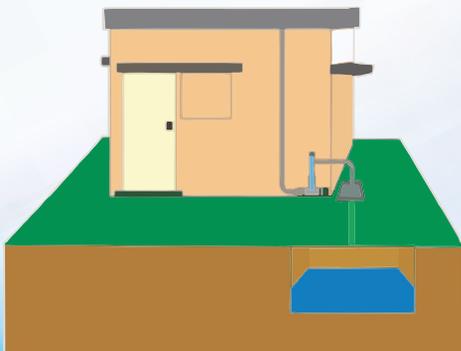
b. Storage of Rain Water in a Underground Sump
